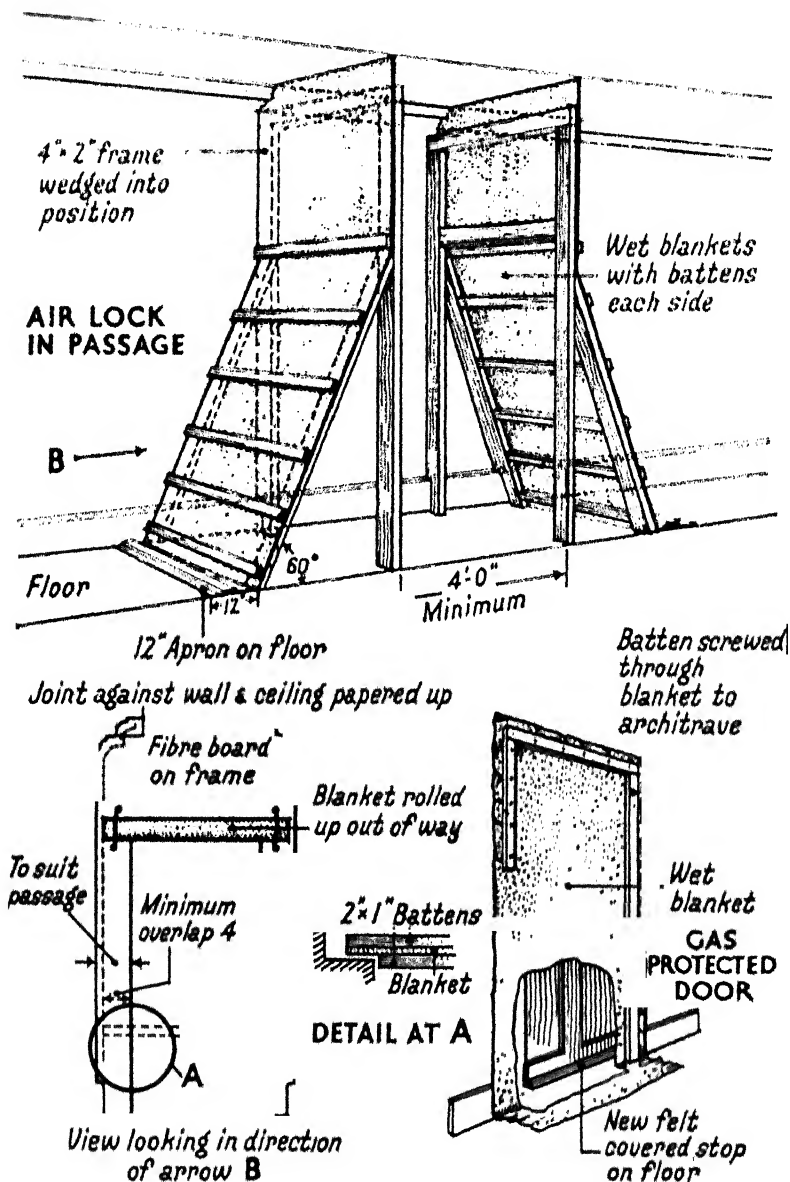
Air lock in corridor in building, and method of fixing gas blanket over ordinary door.
